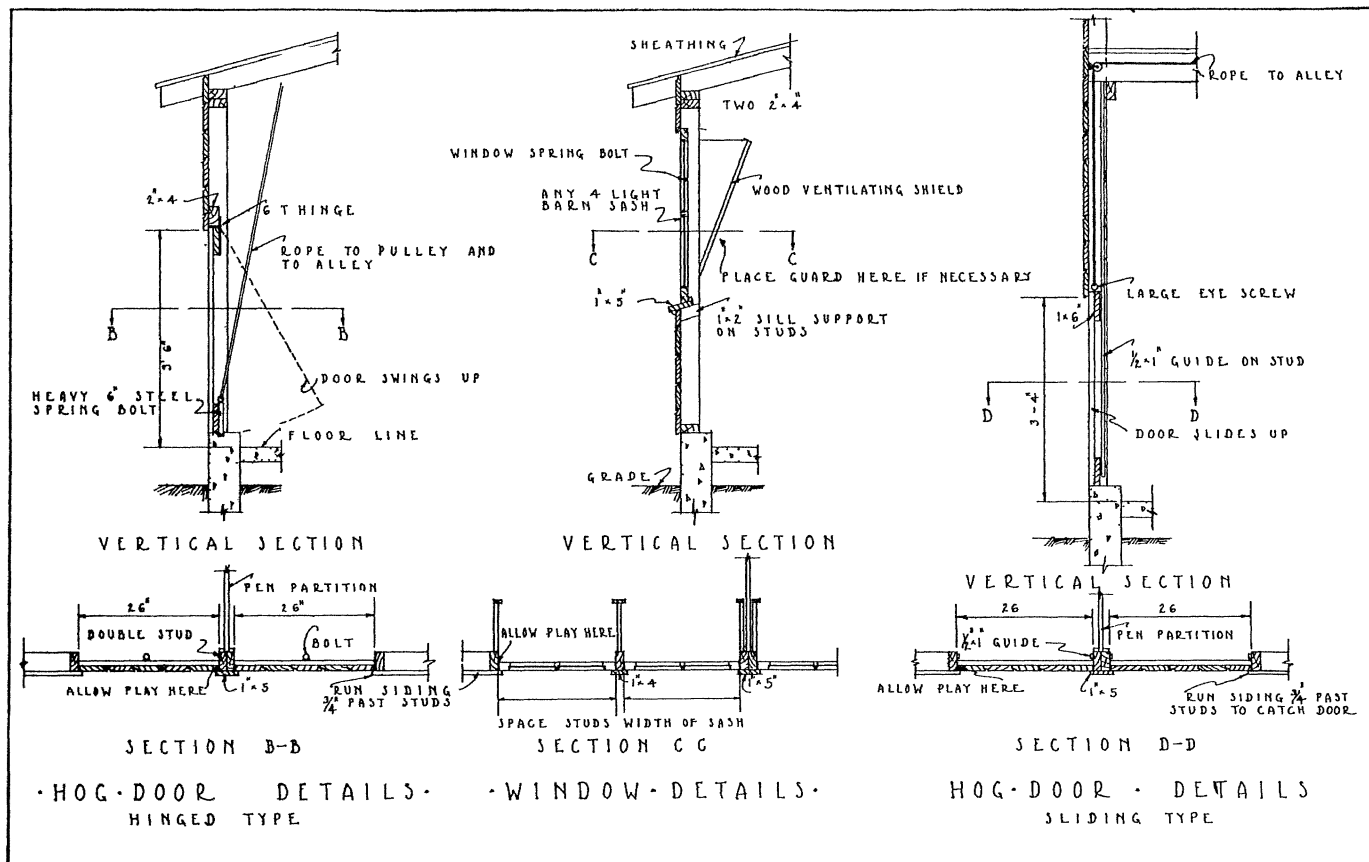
Hog door and window details Space the stud the width of the window sash allowing a small amount for play
